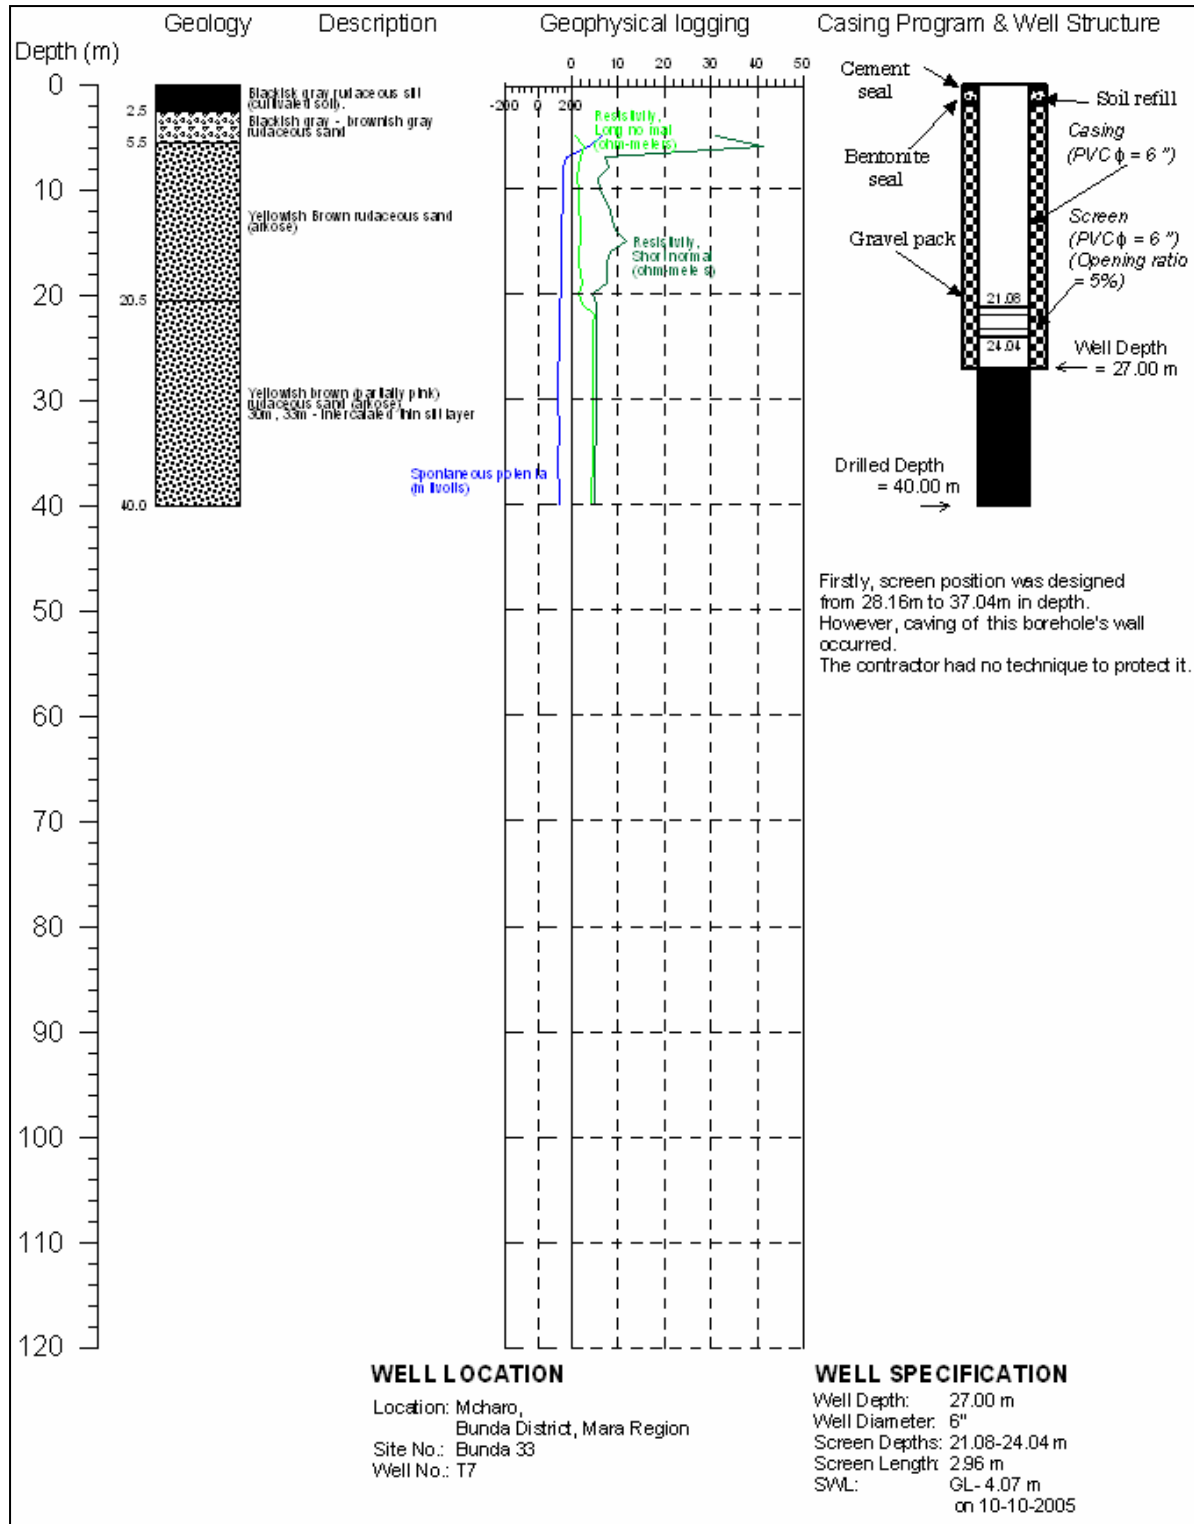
Columnar and Section and Well Structure (Mcharo)
